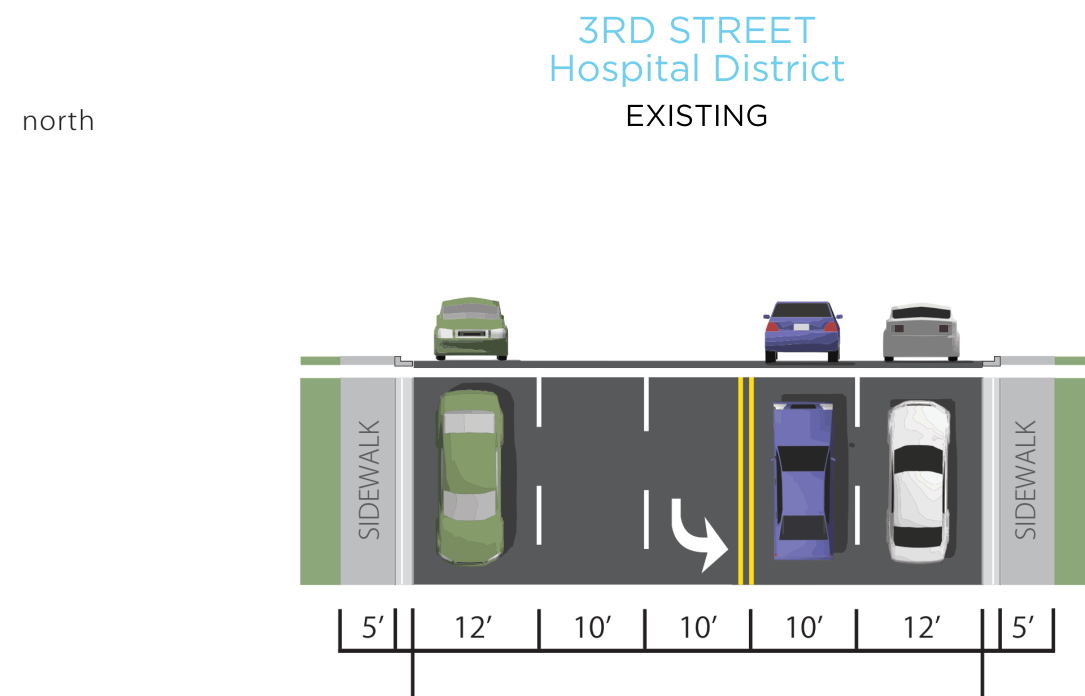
3rd Street Cross-Section | Hospital District, Existing
